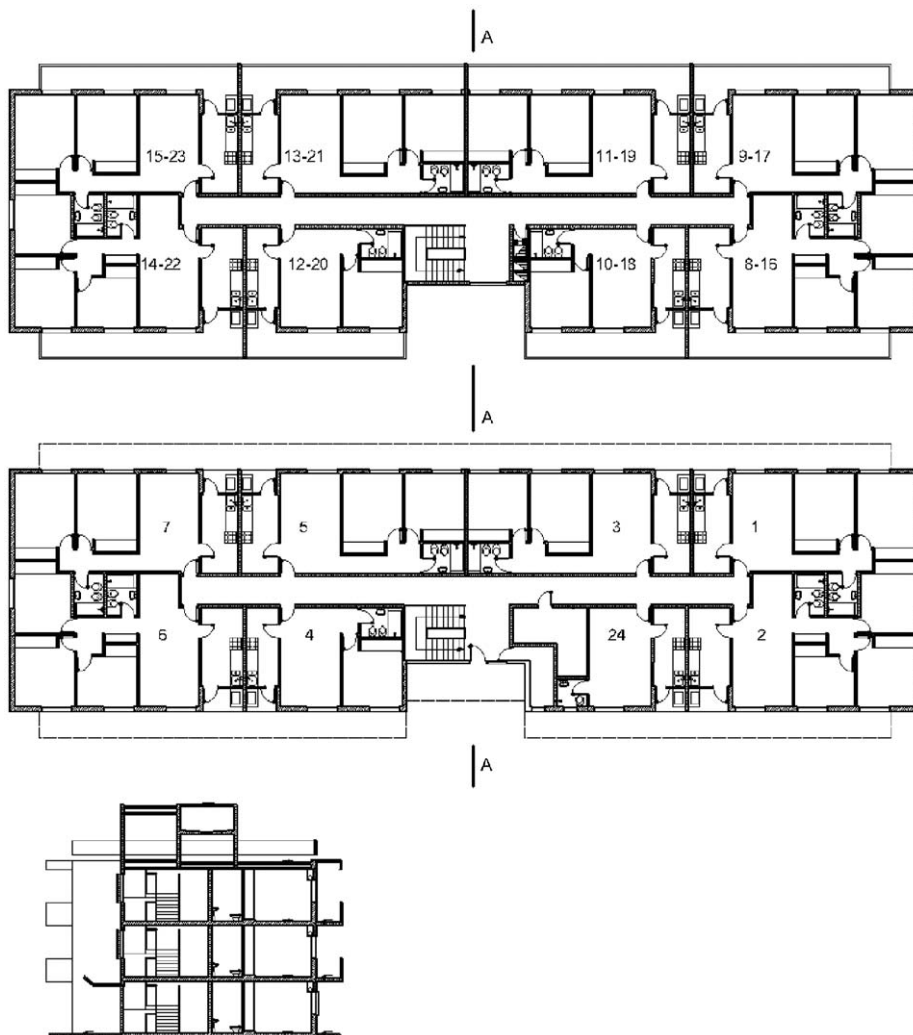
Plan view and section of the studied blocks. The azimuth of northern façade is 150° (south = 0°).
